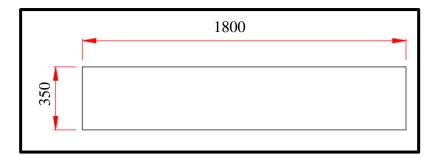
Cross Section of the Precast Concrete Arch Panel
